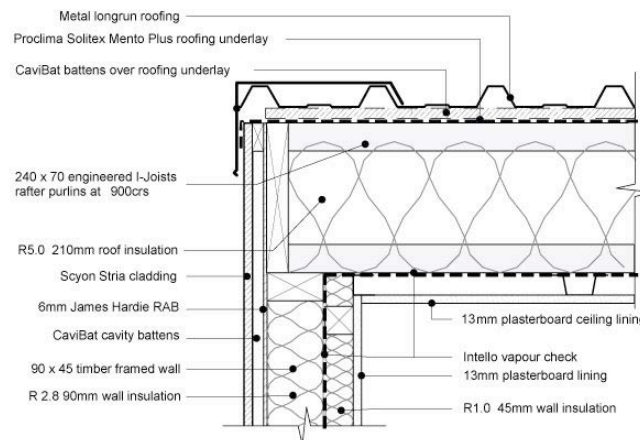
Roof junction to exterior wall barge detail, supplied by S3 Architects Ltd
